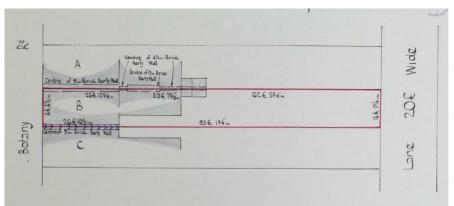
Plan from the NSW Certificate of Title 1956, shows Lot B (No. 1017) with similar building layout as Lot A (No, 1015)
